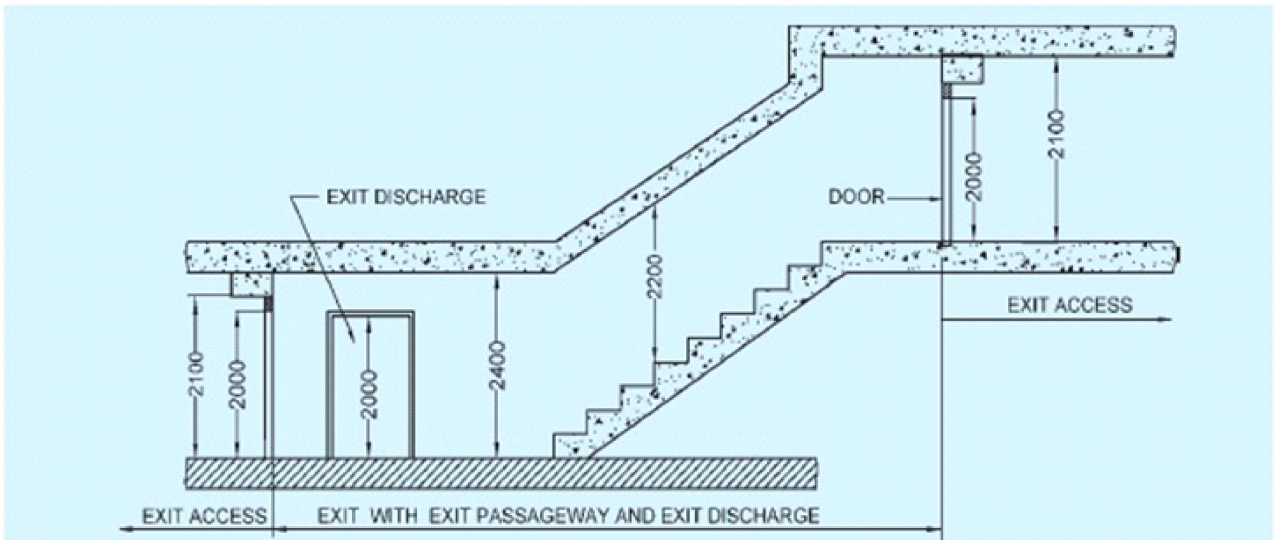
B. Door location at Landing in Fire Exits (See Regulation 15.9.2 (h))
